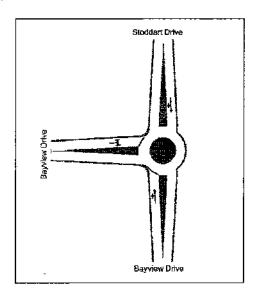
Intersection Geometry: Stoddart Drive/Bayview Drive
